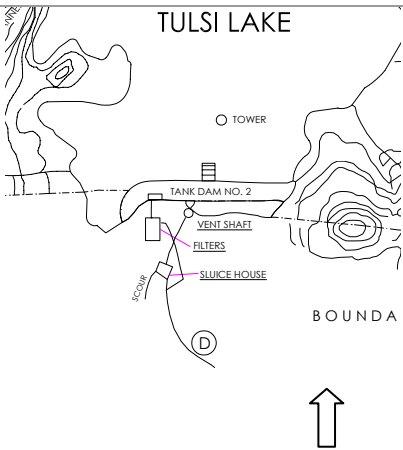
T-TULSI OUTLET TOWER
